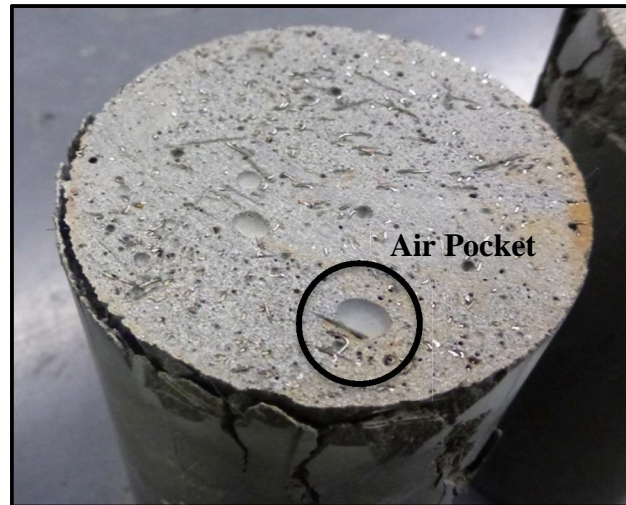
Typical UHPC Cylinder End After Grinding (Shown After Failure)
